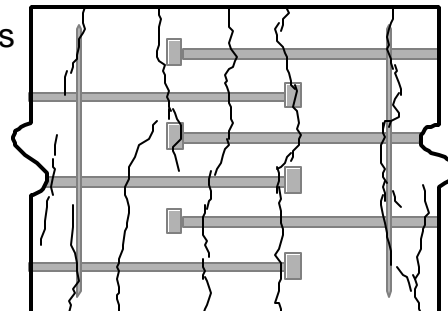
Crack development in a typical unconfined lap splice test (specimen LS-08-04.04-12-10(N)-1)
